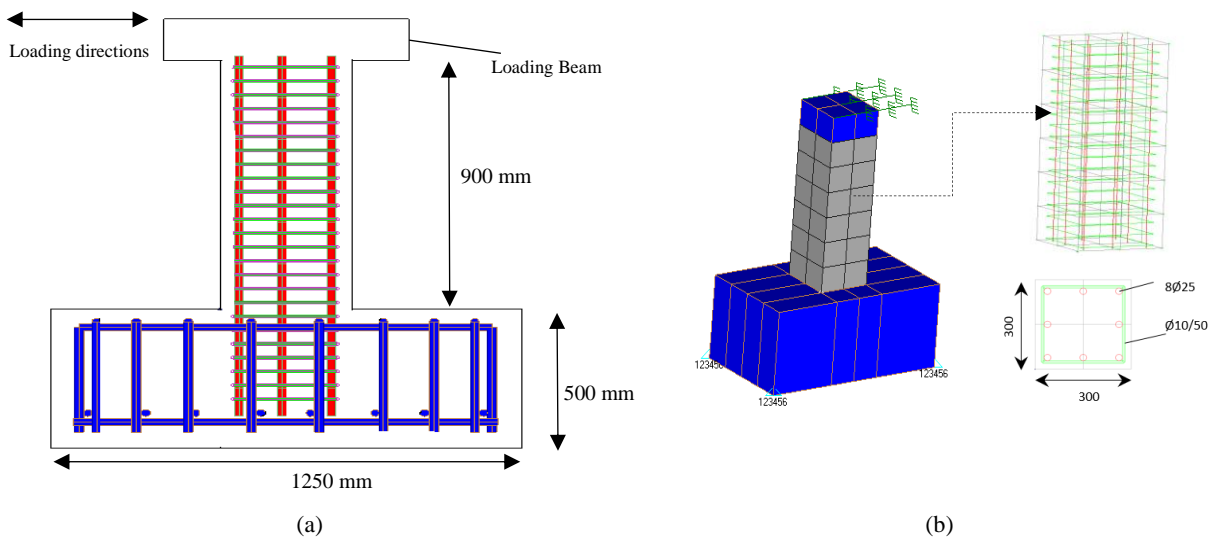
RC Column. (a) Geometry and reinforcement details [40] (b) Hexahedral and embedded rebar meshes.
